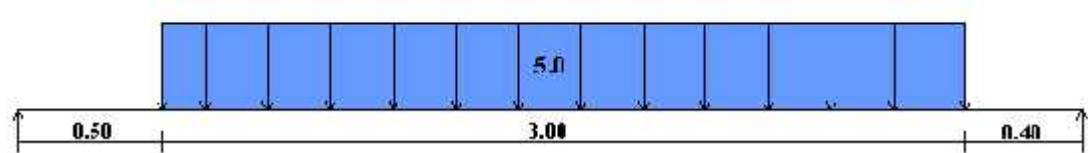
Structural system of stairs at section (B-B & C-C)
